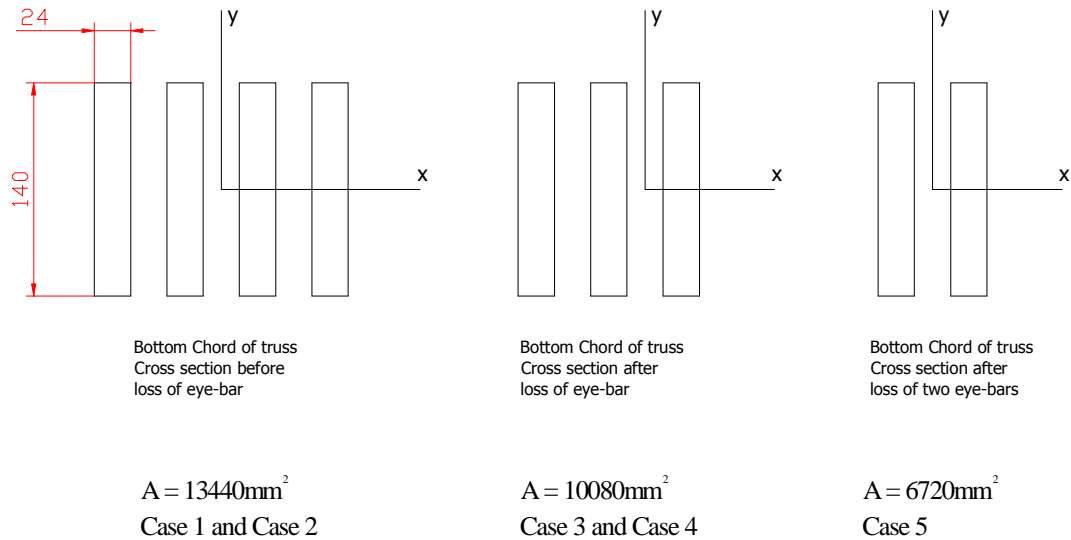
Cross section of bottom chord eye-bars in Liverpool Lime Street Station roof truss for Cases 2, 3, 4 and 5.
